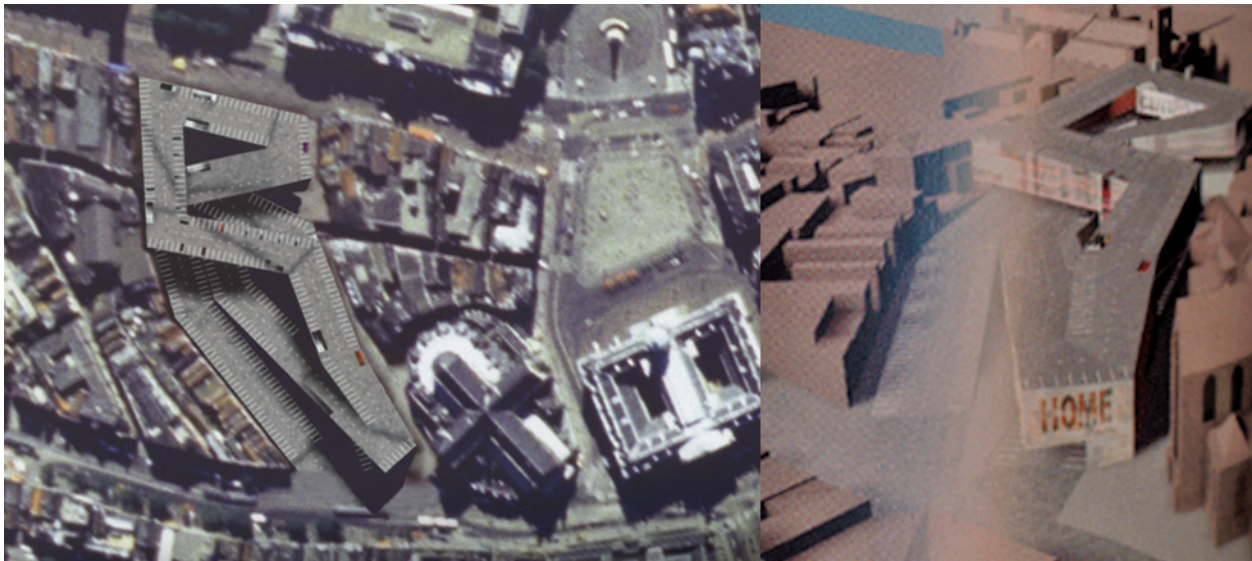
Parkhouse/ Carstadt Merges Roof and Parking
